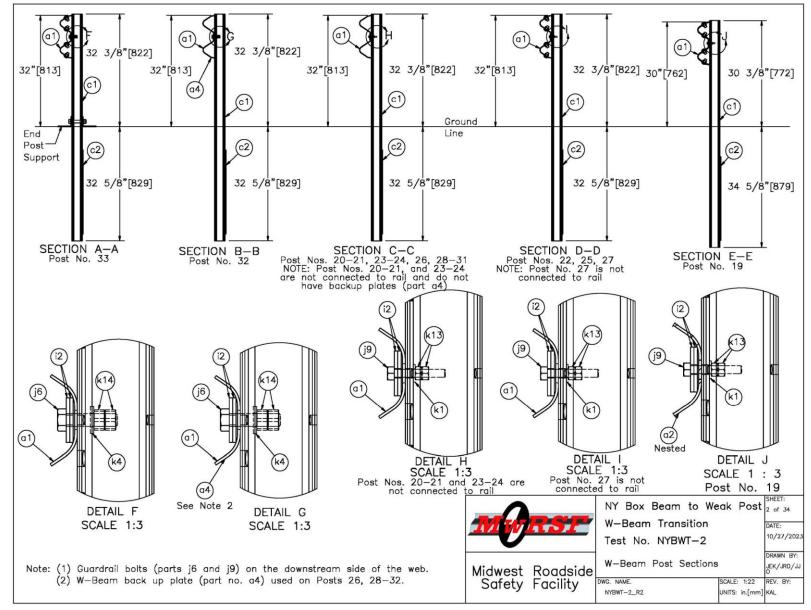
W-Beam Post Section, Test No. NYBWT-2
